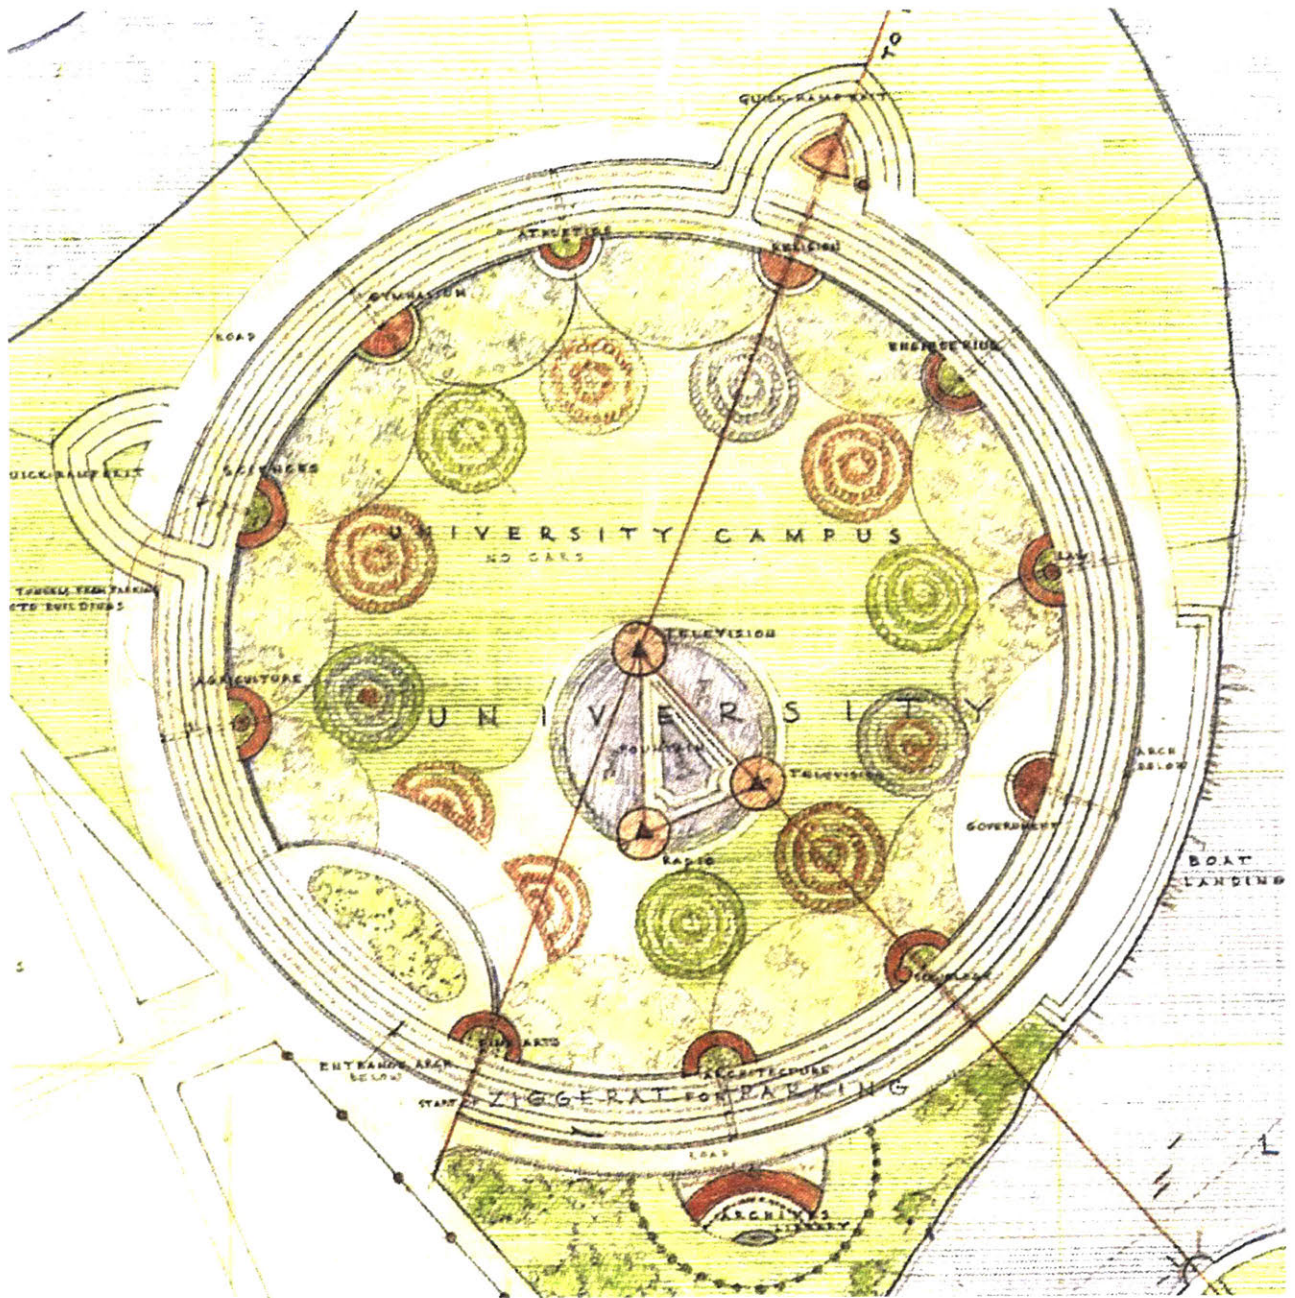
(detail) Plan for Greater Baghdad, site plan, June 20, 1957. FLWFA
